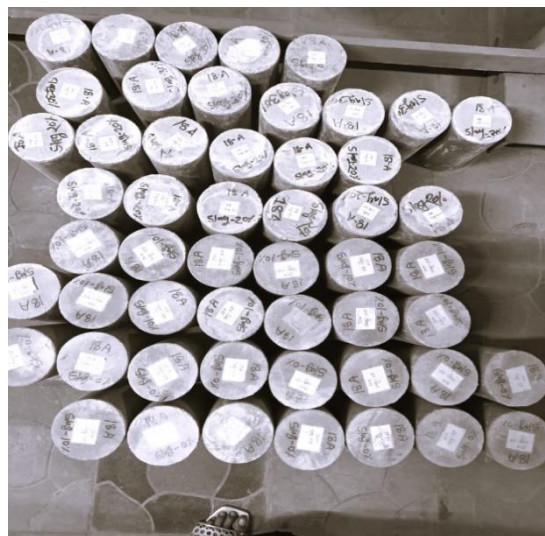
Replaced Recycled Aggregate Concrete Cylinder Before Crashing
